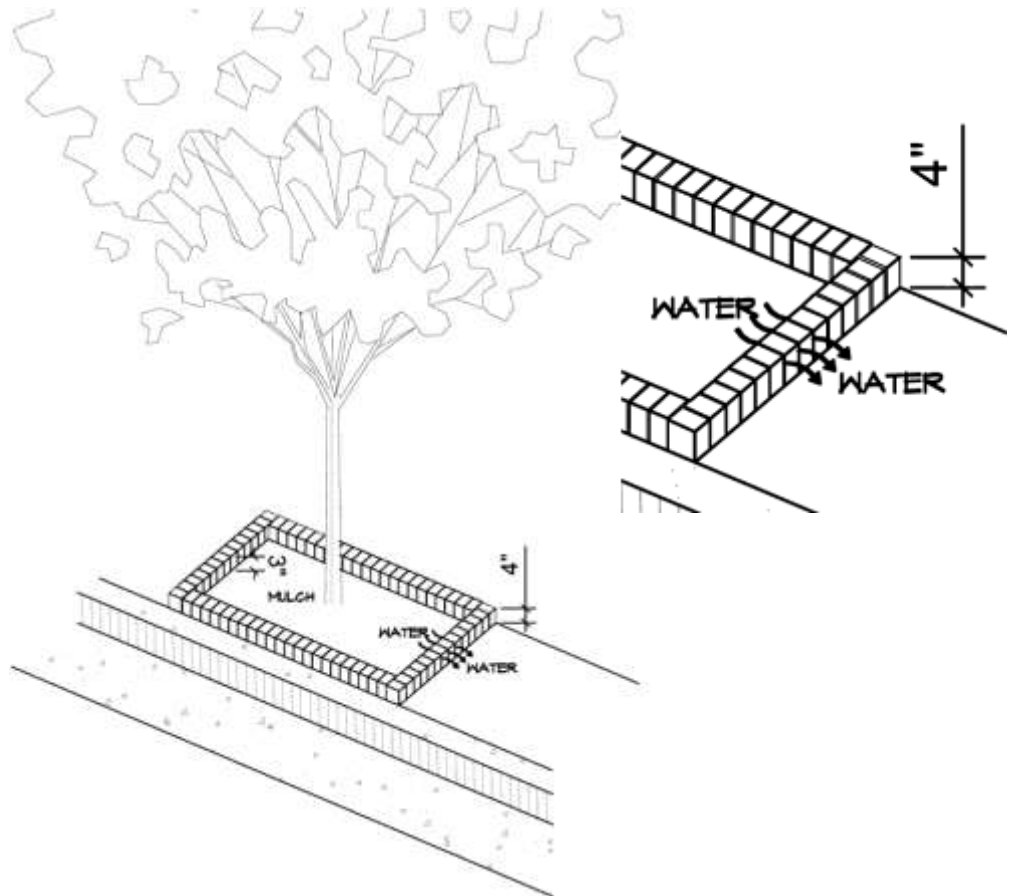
Standard Landscape Zone Treatment – Brick Edger
